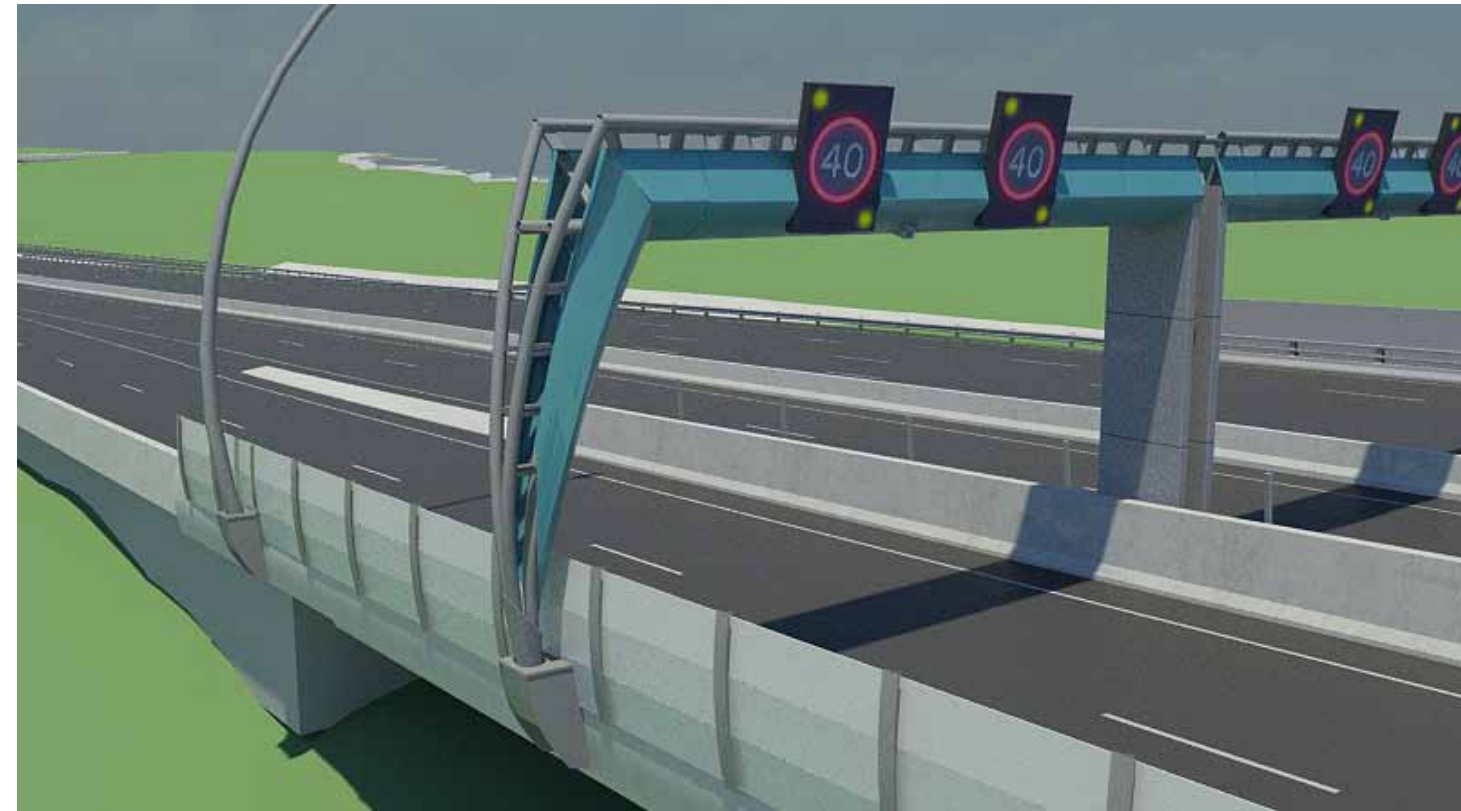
Indicative 3D study of gantry pier interfacing with other built form elements i.e. viaduct structure and noise wall.
